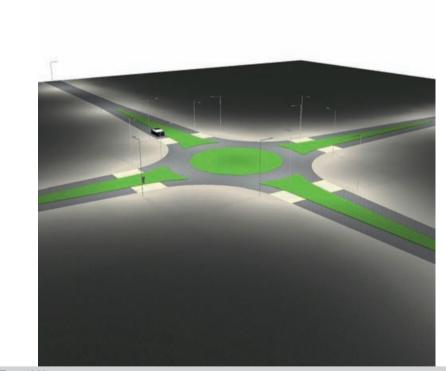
3D Rendering of a typical one lane roundabout street lighting layout.
